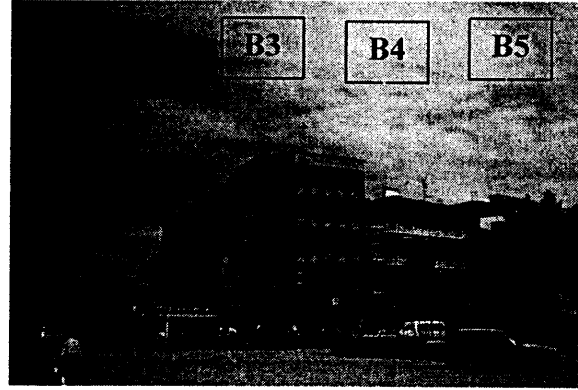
North to south view of buildings B2, B3, B4 and B5. Note that the last floor of building B5 has not been built.
